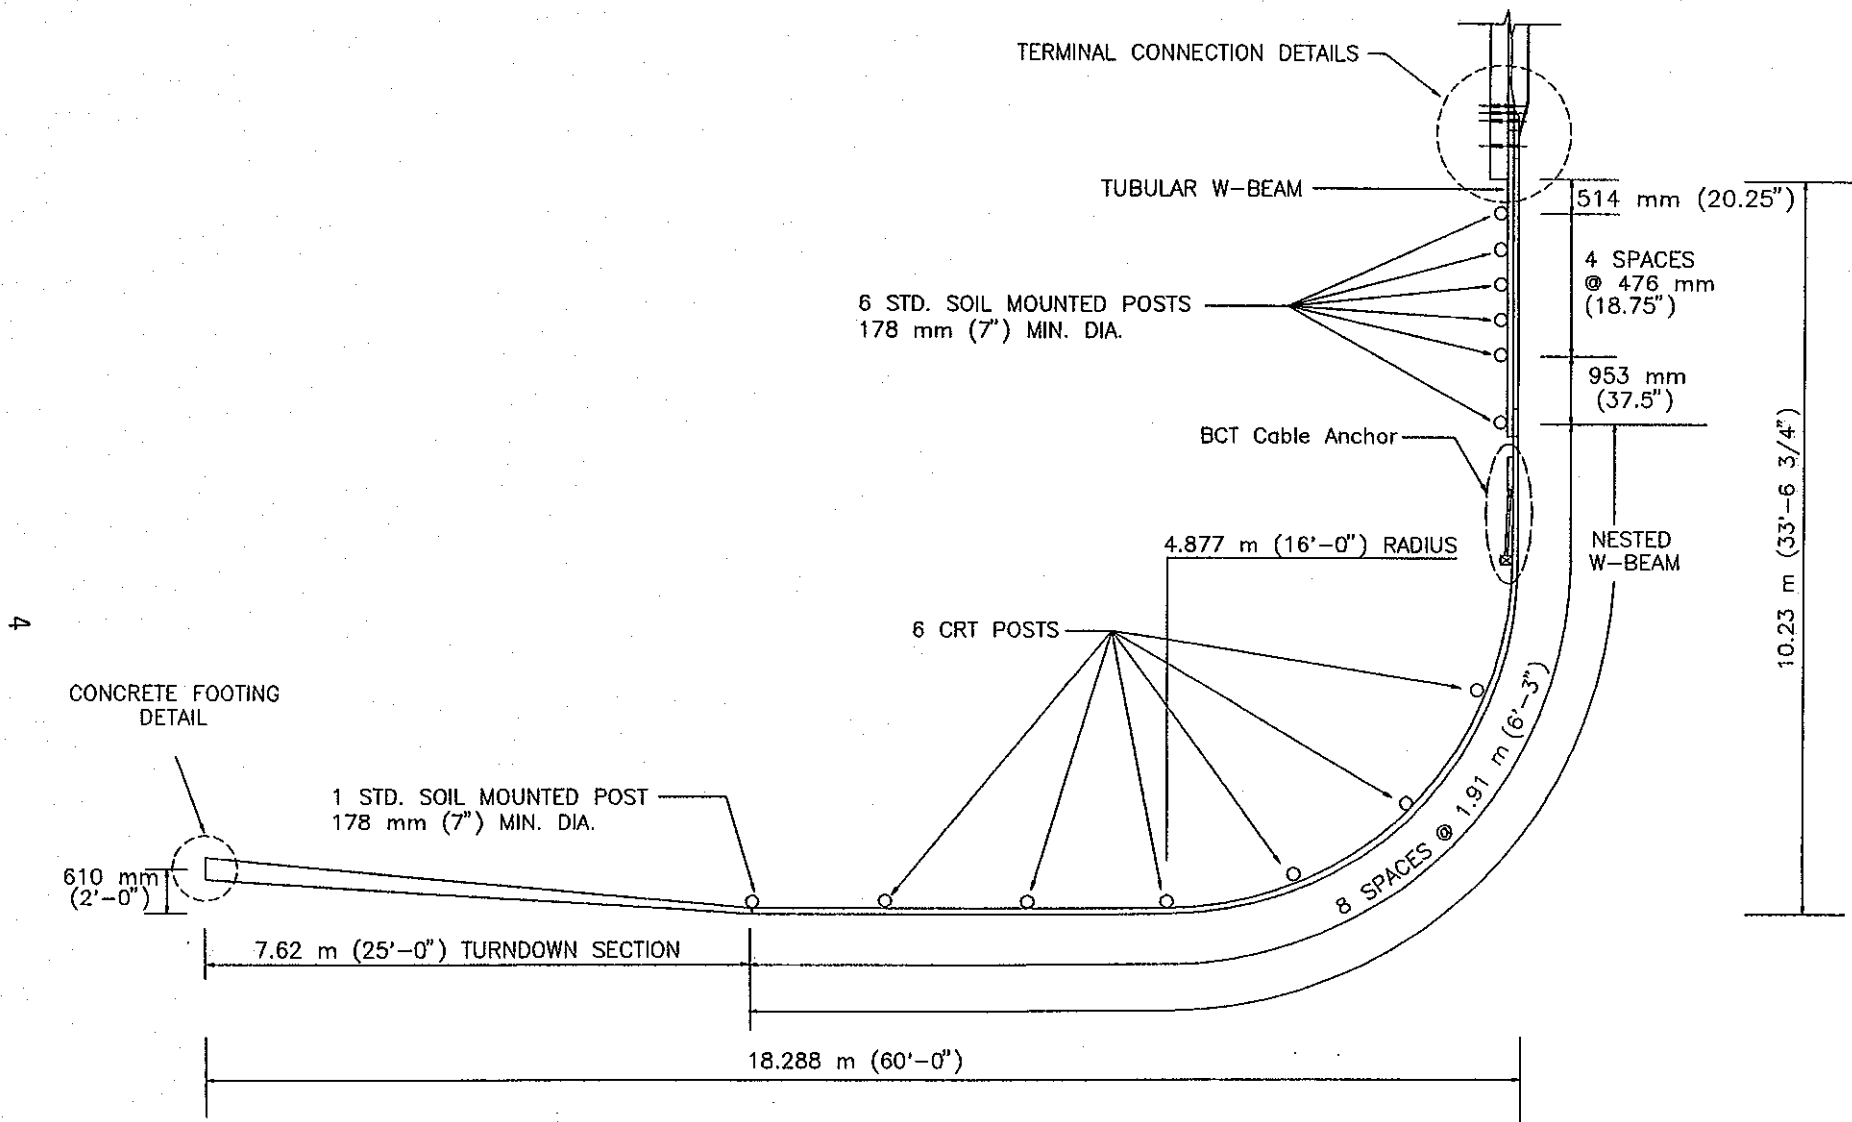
Short-radius nested W-beam guardrail treatment (2).
